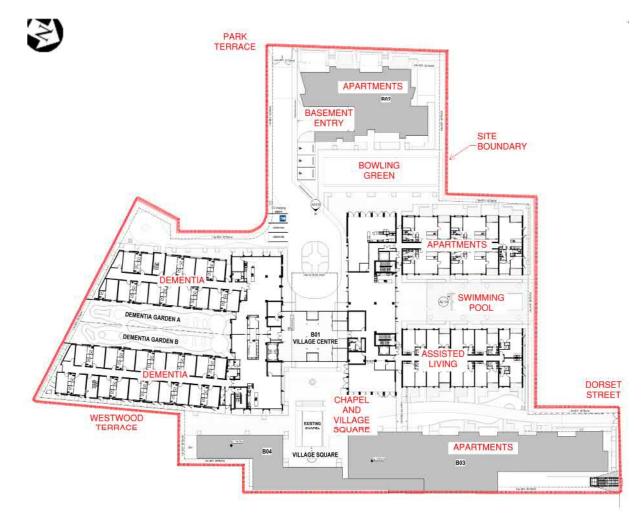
Site 1 Bishopspark Proposed Site Layout
